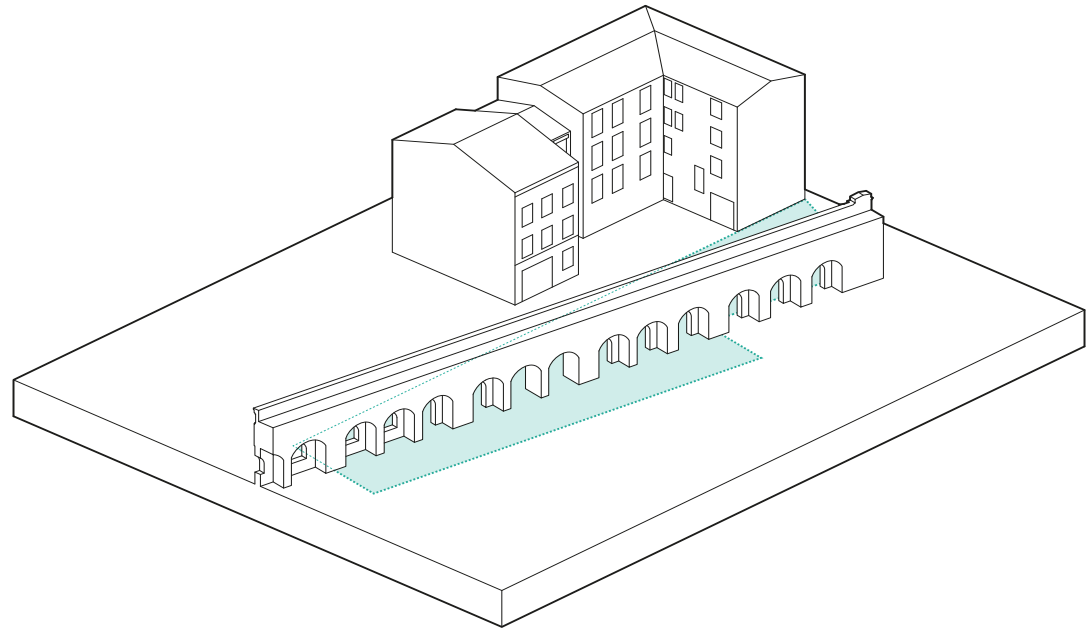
Site extents, neighbouring dwellings and existing boundary wall
